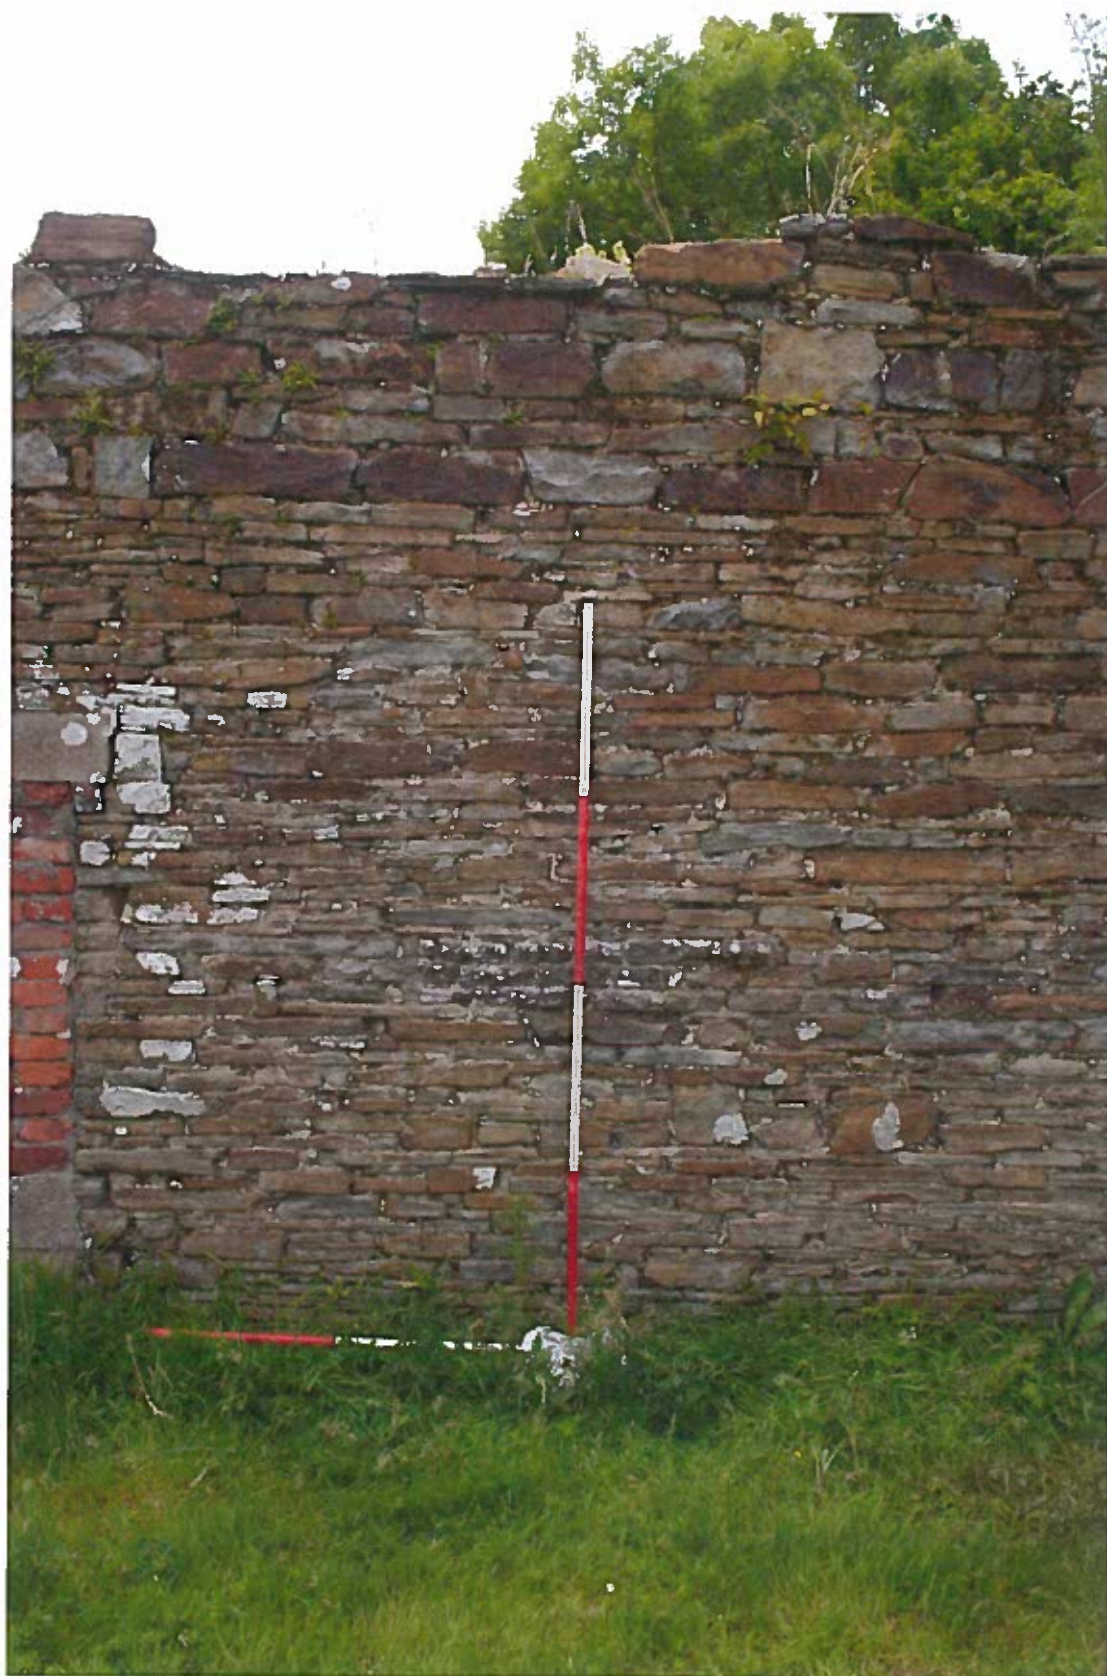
Extension wall from southeast area of larger stone visible above vertical scale. Shot 4.
